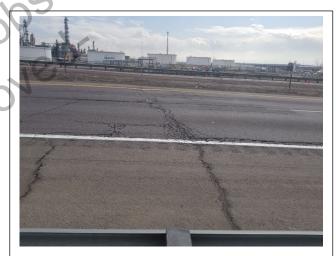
Example of Transverse Cracking and Deteriorating Pavement on I-270
